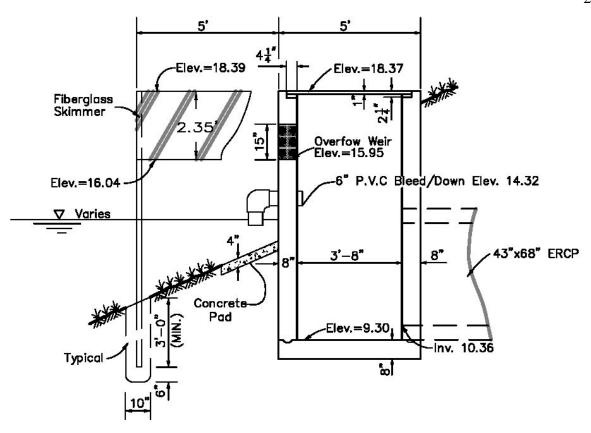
Detail of the Outfall Control Structure for the Basin 7 Wet Detention Pond.
